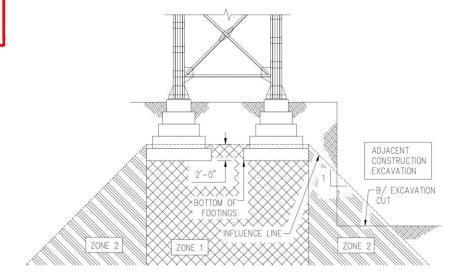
1: Elevated Track Structure Footing Zone of Influence
